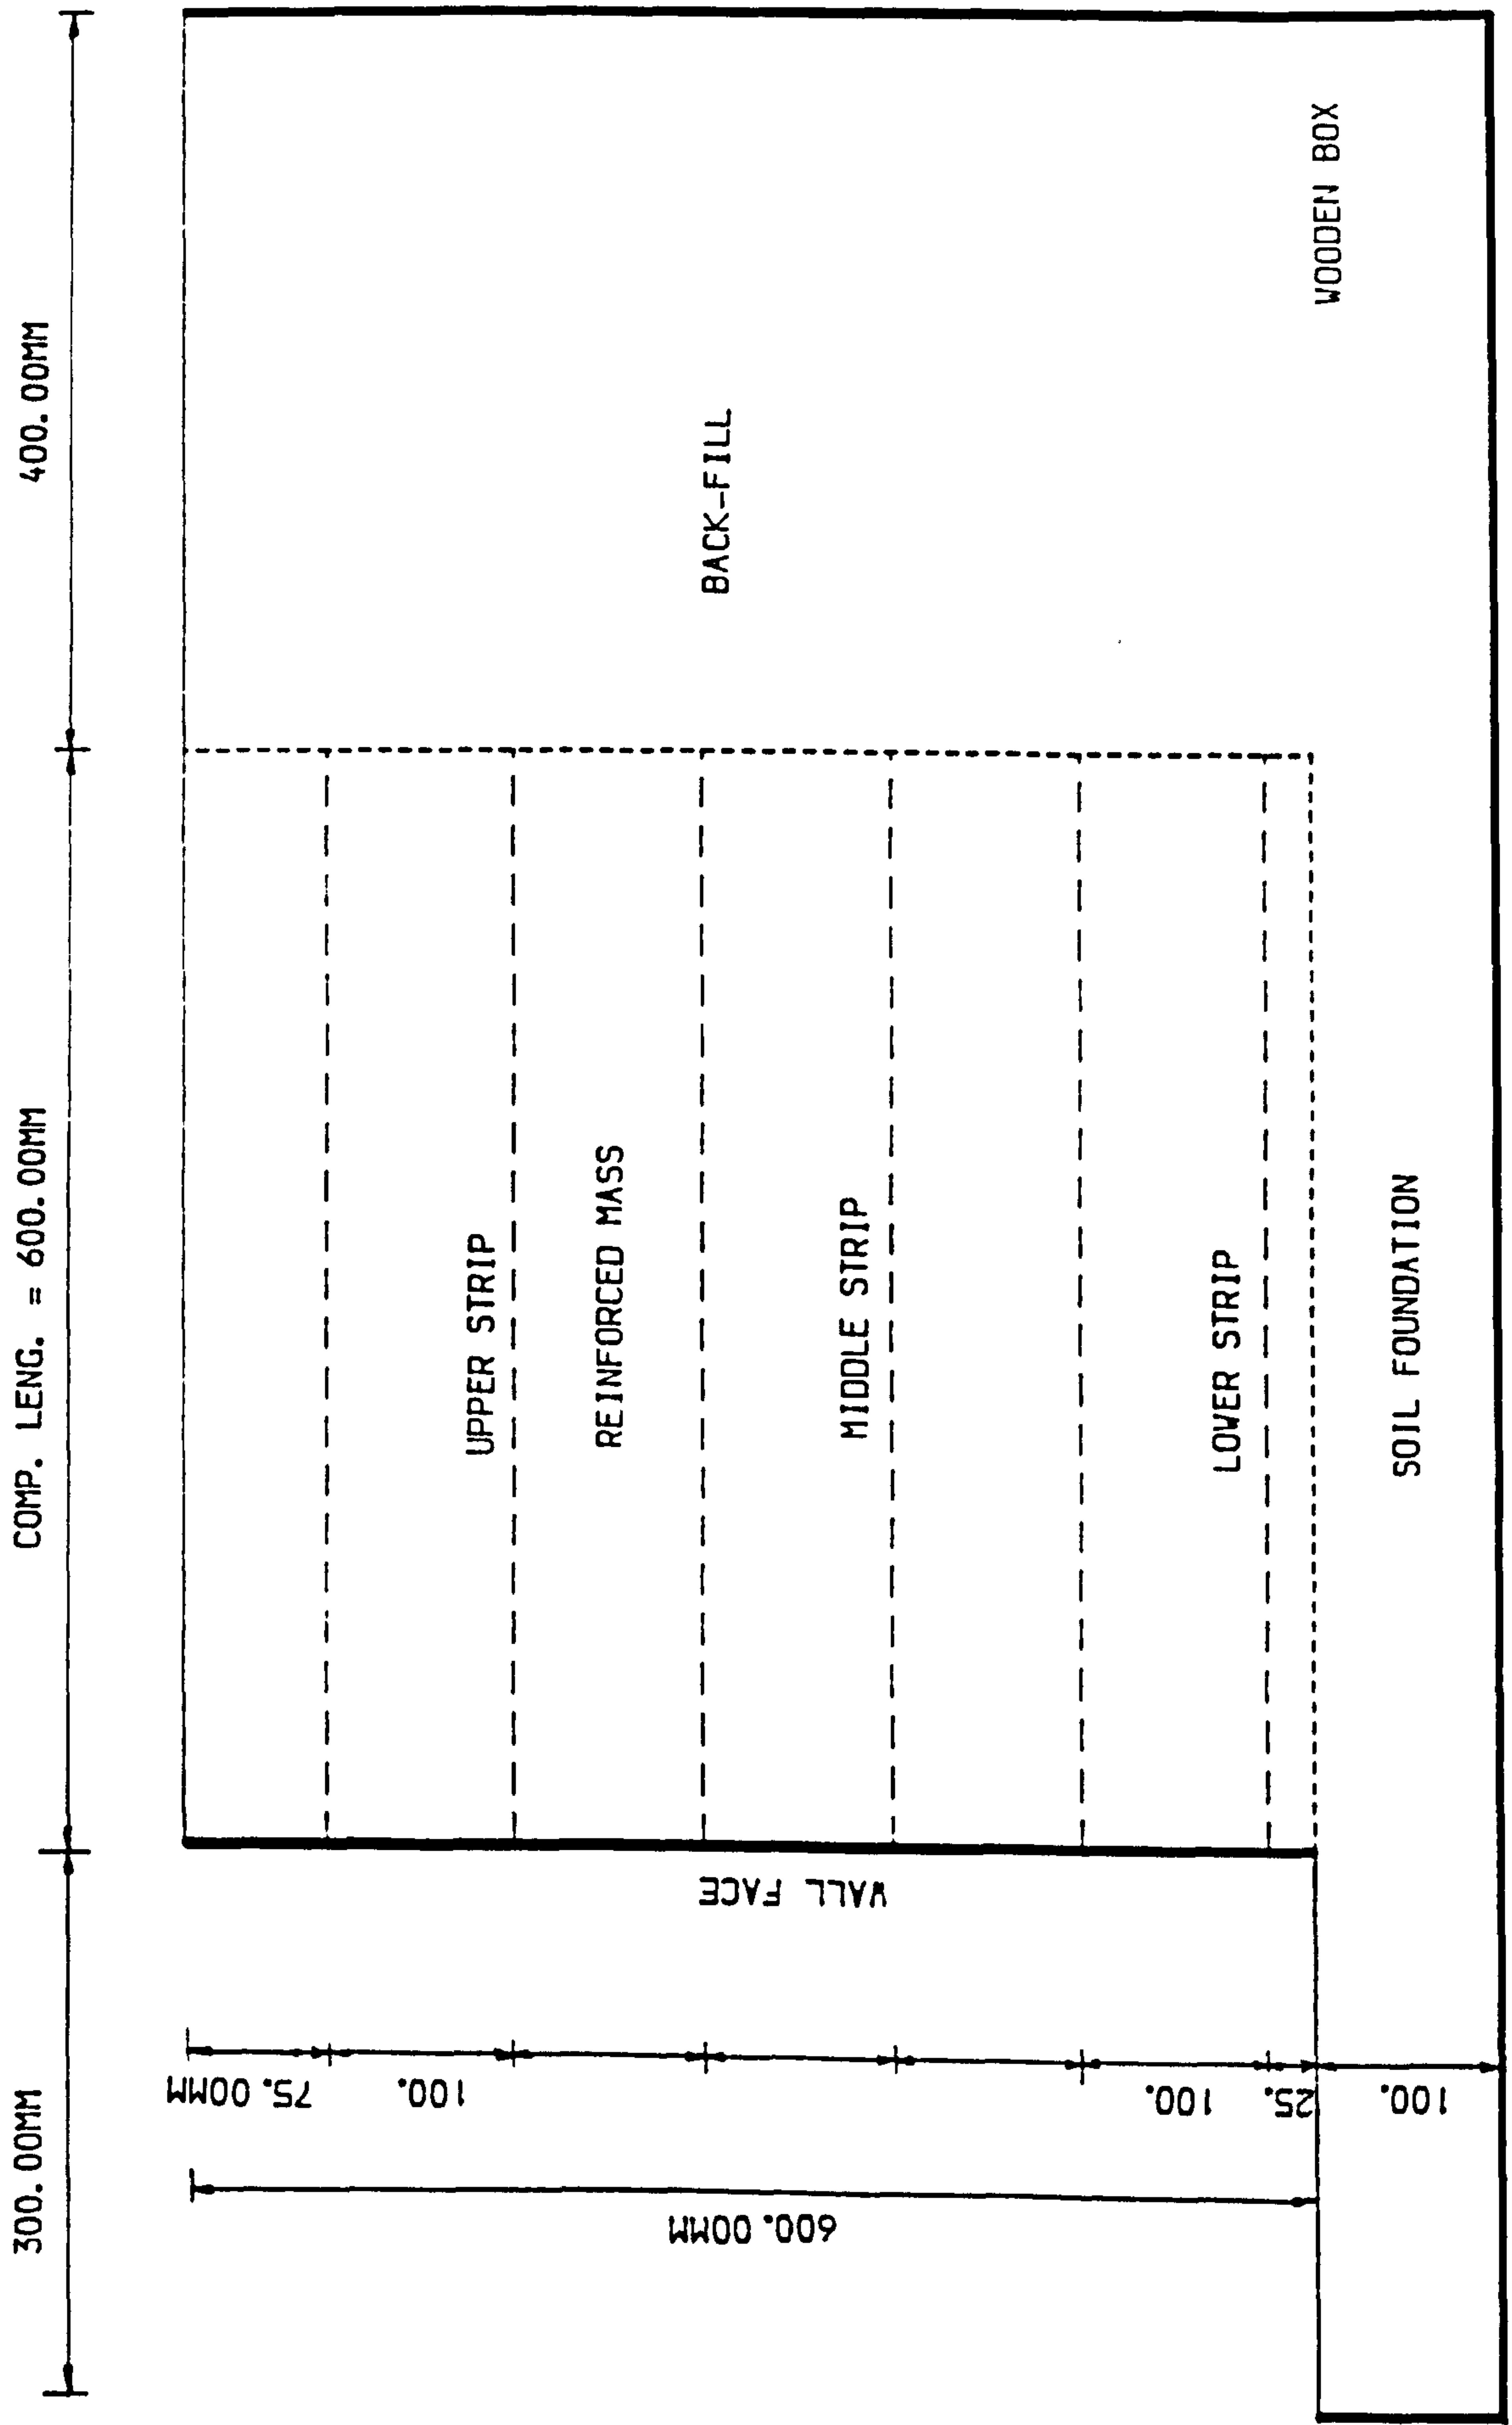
1) THE MODEL REINFORCED EARTH WALL
